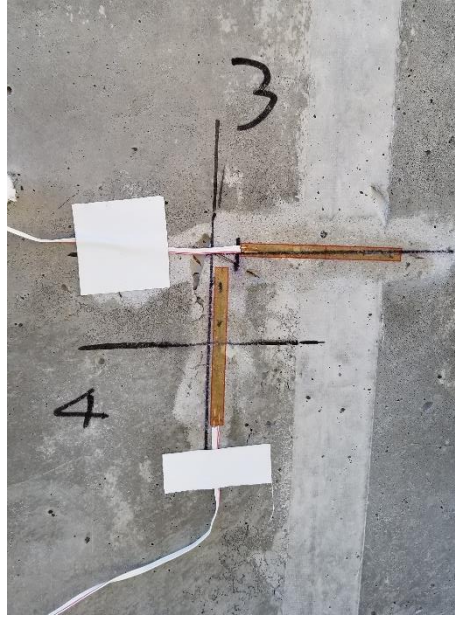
Concrete strain gages (3 and 4) adhered to concrete rail surface
